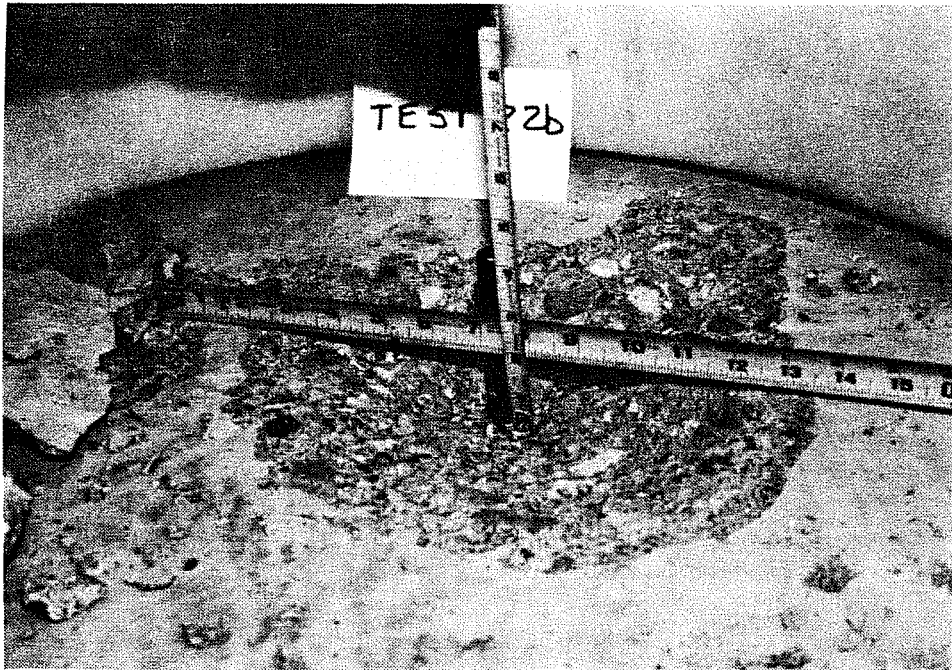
Mode 5 Behavior (Failure of the Bond Between the Adhesive and the Anchor Steel) for Adhesive and Grouted Anchors
